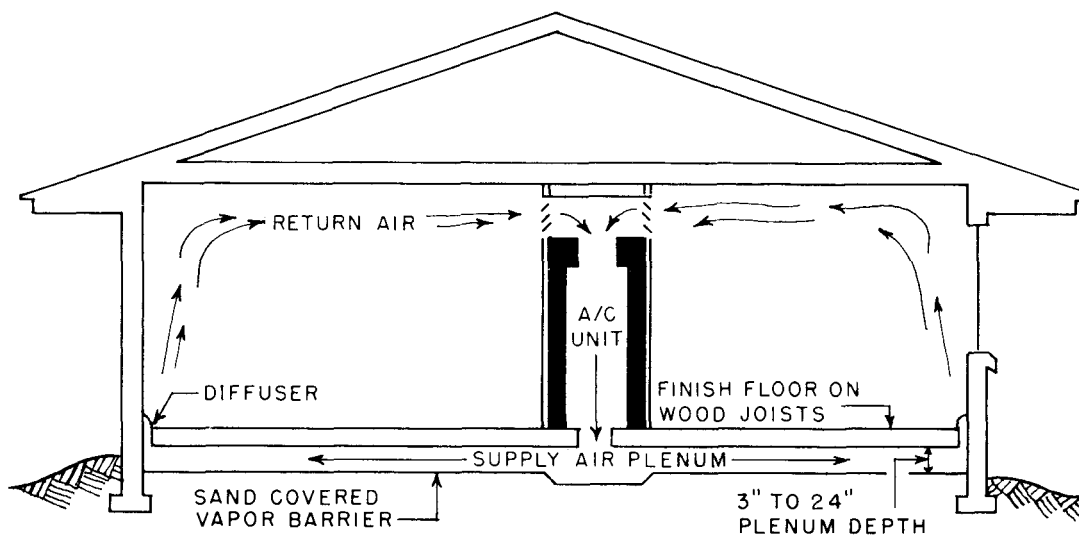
The low profile plenum floor foundation design illustrates a new concept for cool and warm air distribution. The underfloor plenum provides a supply of air. Underfloor ductwork is not necessary.
